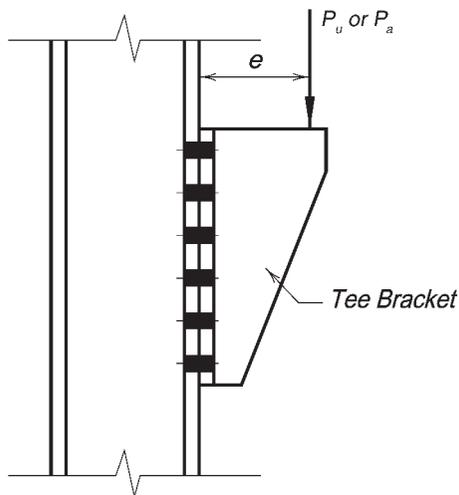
Tee bracket subject to eccentric loading normal to the plane of the faying surface.
